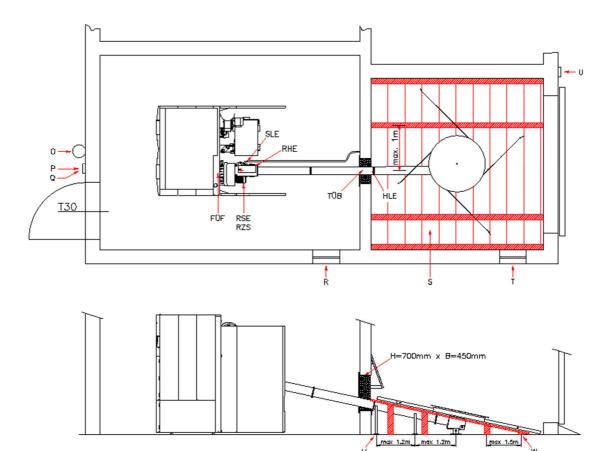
Installation of sloping floor, emergency off switch, air vents, fire extinguisher, wall opening, safety systems
